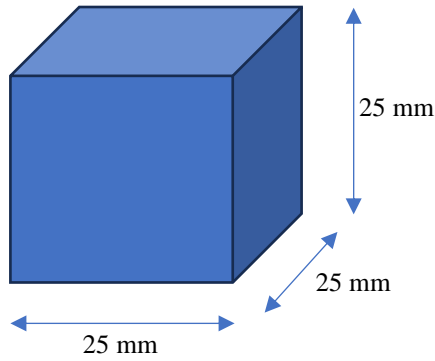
Shape and dimensions of the used specimens for the compressive strength test
